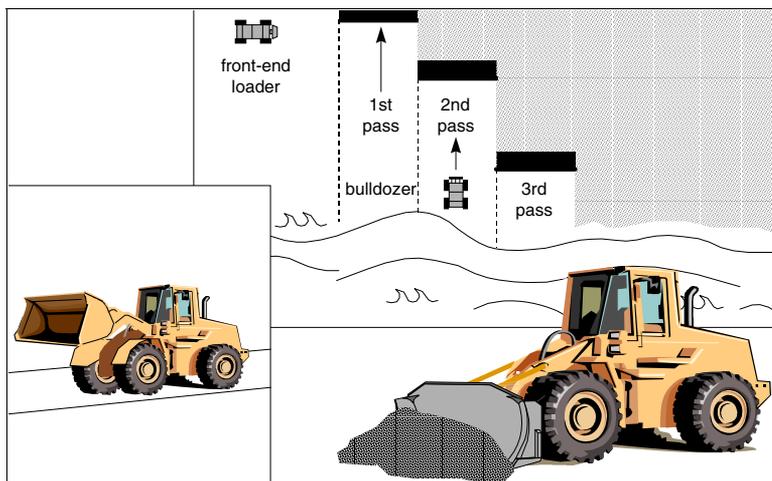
40 Two-stage removal with bulldozer supported by front-end loader
